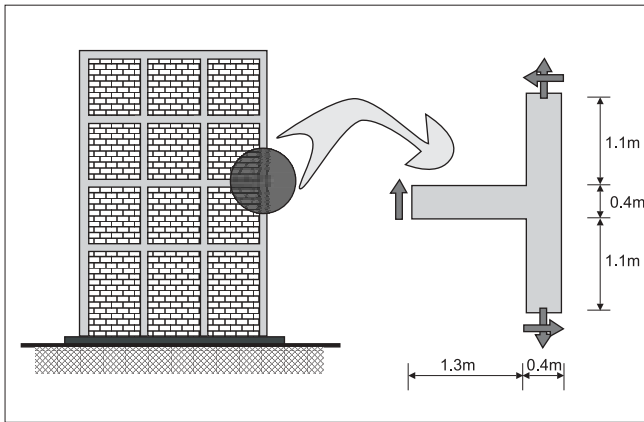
Exterior beam-column sub-assembly of an RC frame building, geometry and forces acting on it when it swings from right to left
